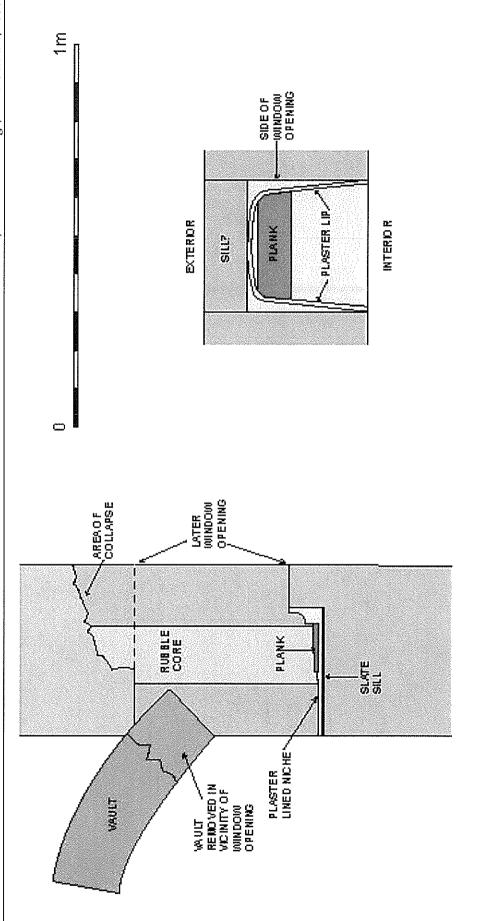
Schematic cross section through wall In location of 'window' feature (facing north)
